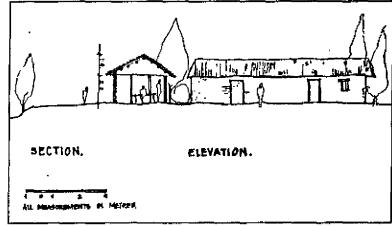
ELEVATION AND SECTION OF A TYPICAL SINGLE STOREY HOUSE IN GARHWAL
